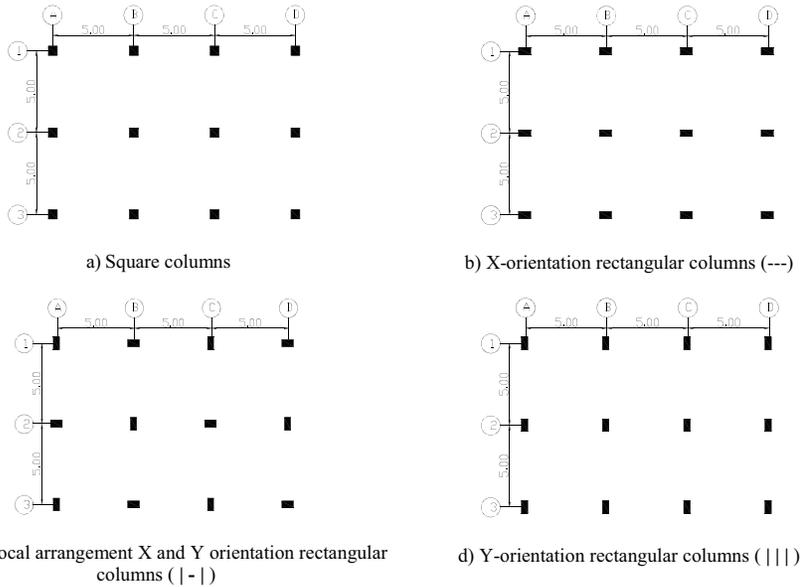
Rectangular floor plan (ratio 1.5) models with different column arrangements and orientations
